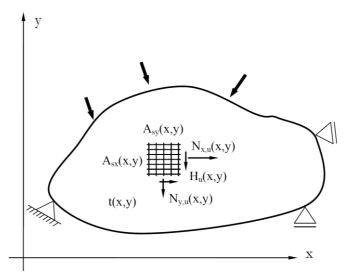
Concrete panel with orthogonal mesh reinforcement.
